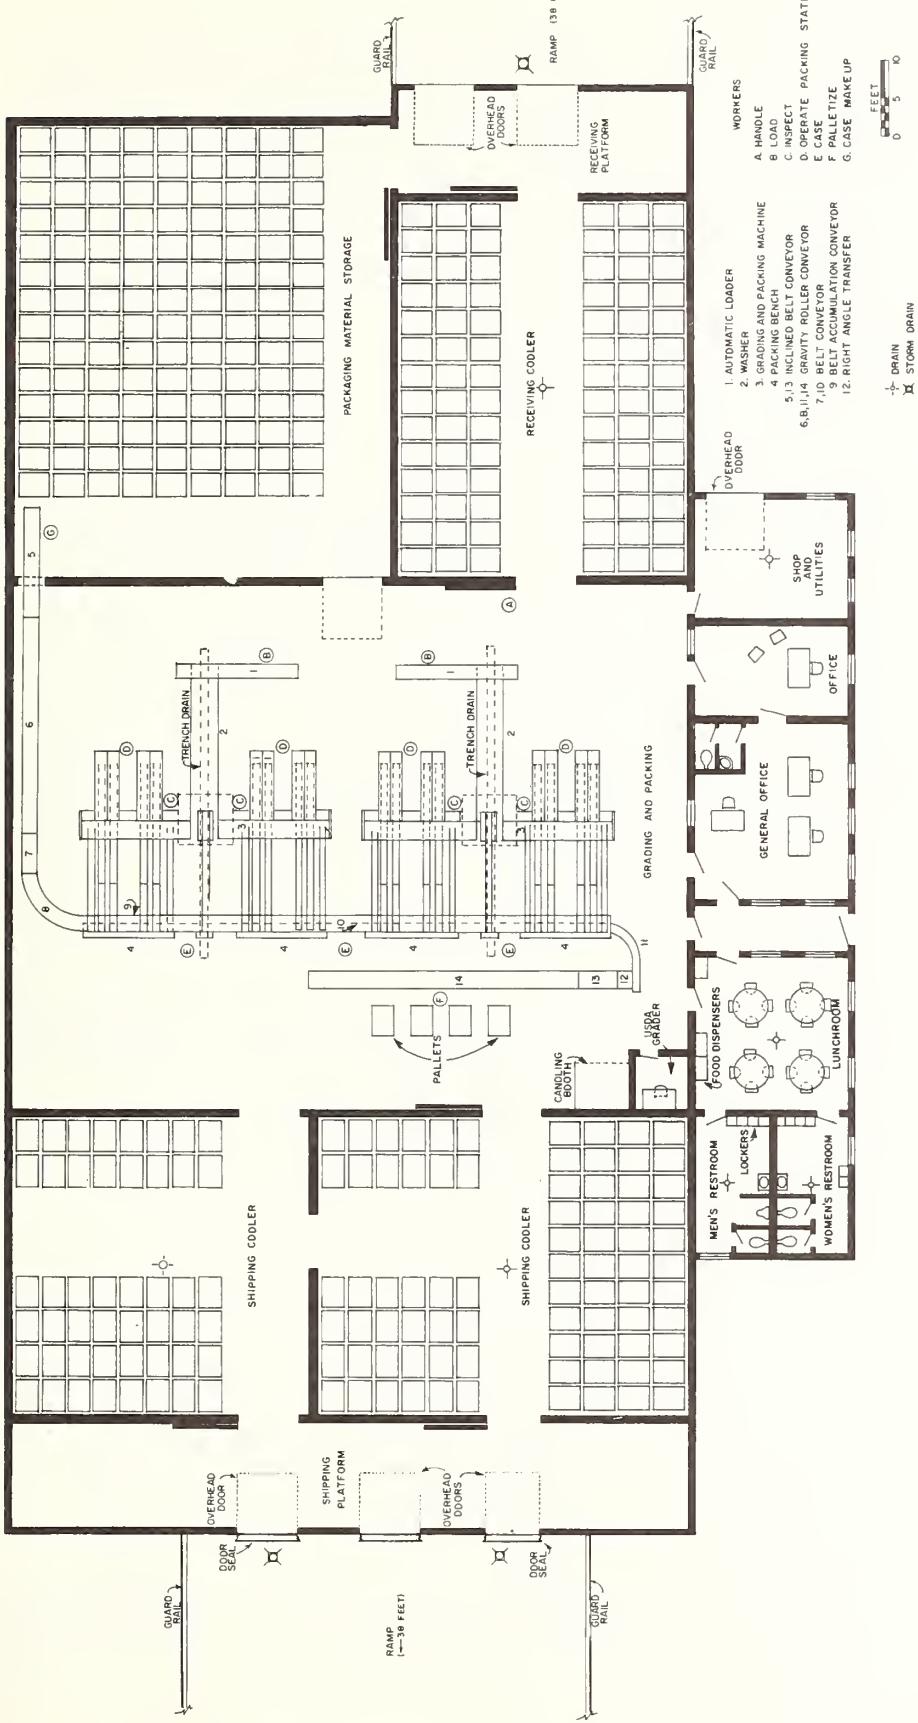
Layout of an expanded shell egg grading and packing plant.
